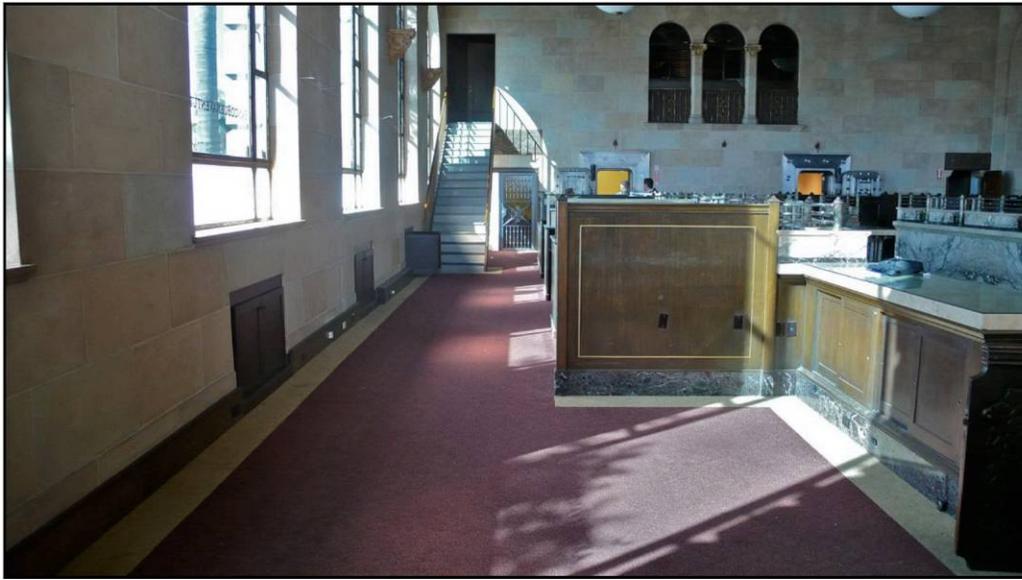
Behind teller cages, west side, facing north, showing wood partition to be removed. [3-4-2013]
